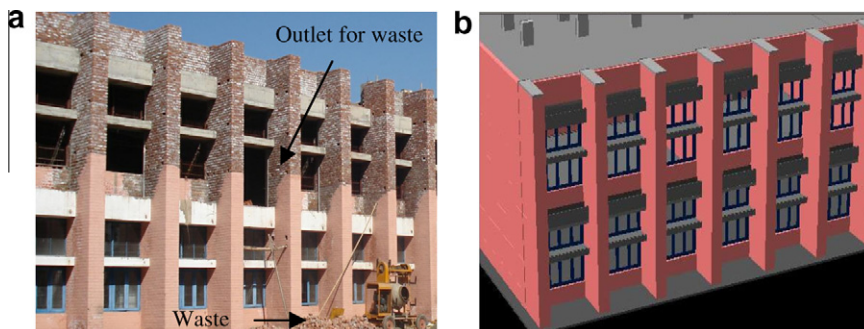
(a) Suitable passage that was kept to bring out the waste and (b) animation does not show such opening because it was not planned earlier.
